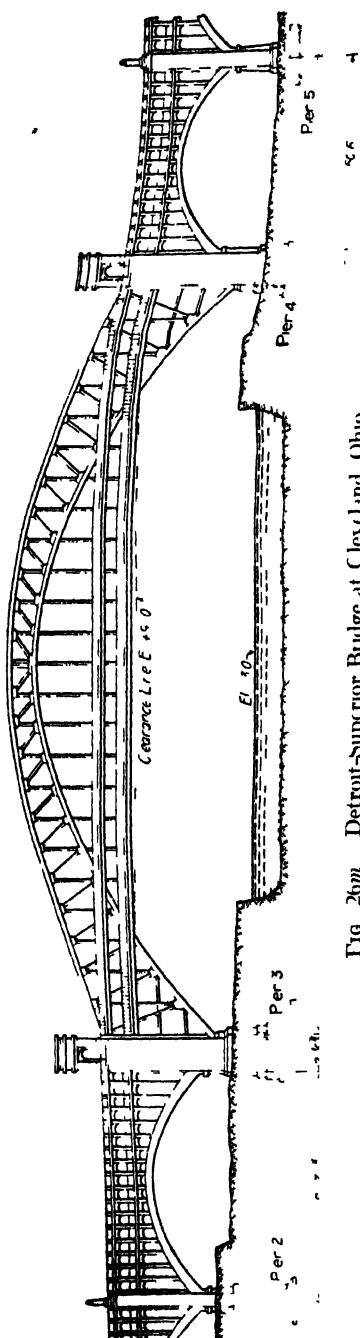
Detroit-Superior Bridge at Cleveland, Ohio
